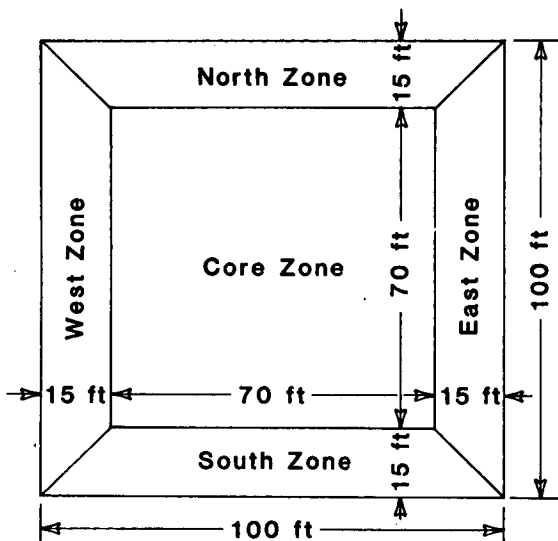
SCHEMATIC FLOOR PLAN OF PROTOTYPE COMMERCIAL BUILDING.
